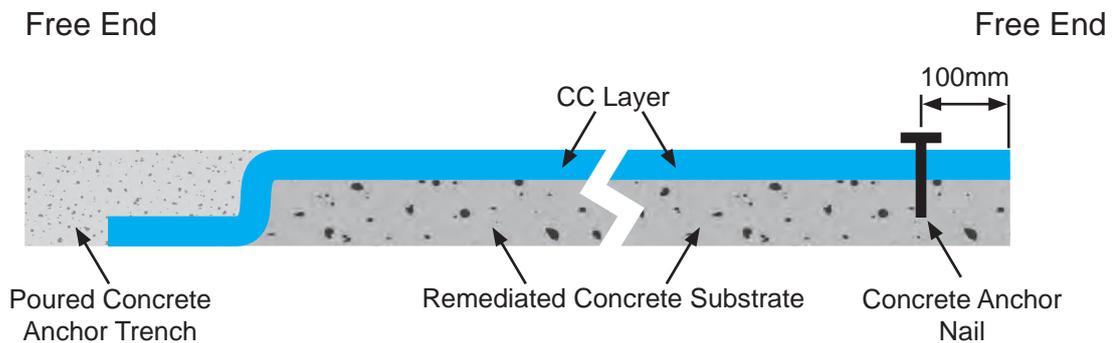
Typical installation of a continuous long section of CC over an extensive concrete substrate. Where anchoring is required either poured concrete anchor trenching or concrete anchor nailing may be used as appropriate
